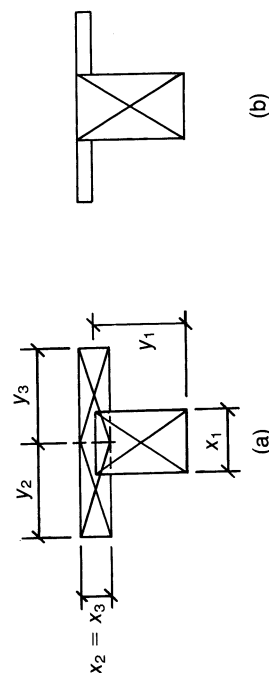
Treatment of sections composed of rectangles: (a) division into component rectangles; (b) use of a single main rectangle
